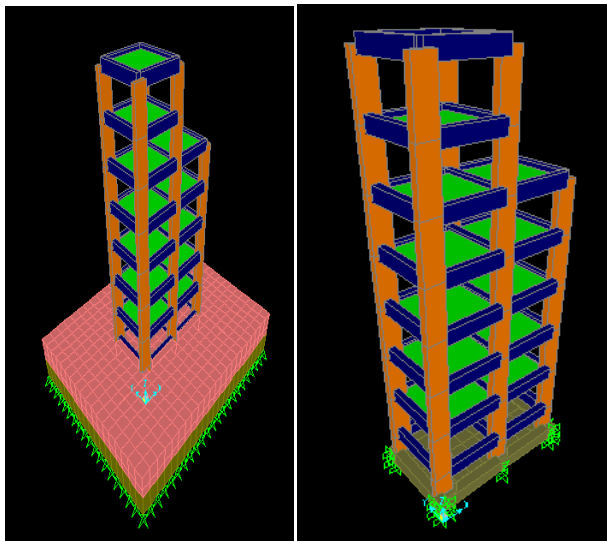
Models of raft foundation of RC building with and without consideration of soil layer
